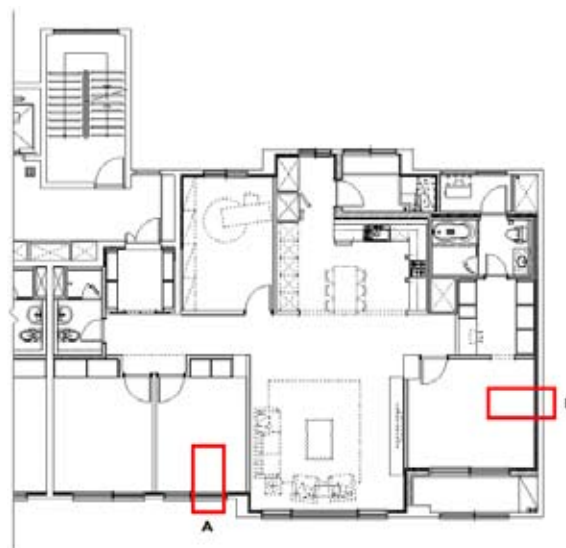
Typical floor plan of "E" apartment building, including hot water pipes for heating
